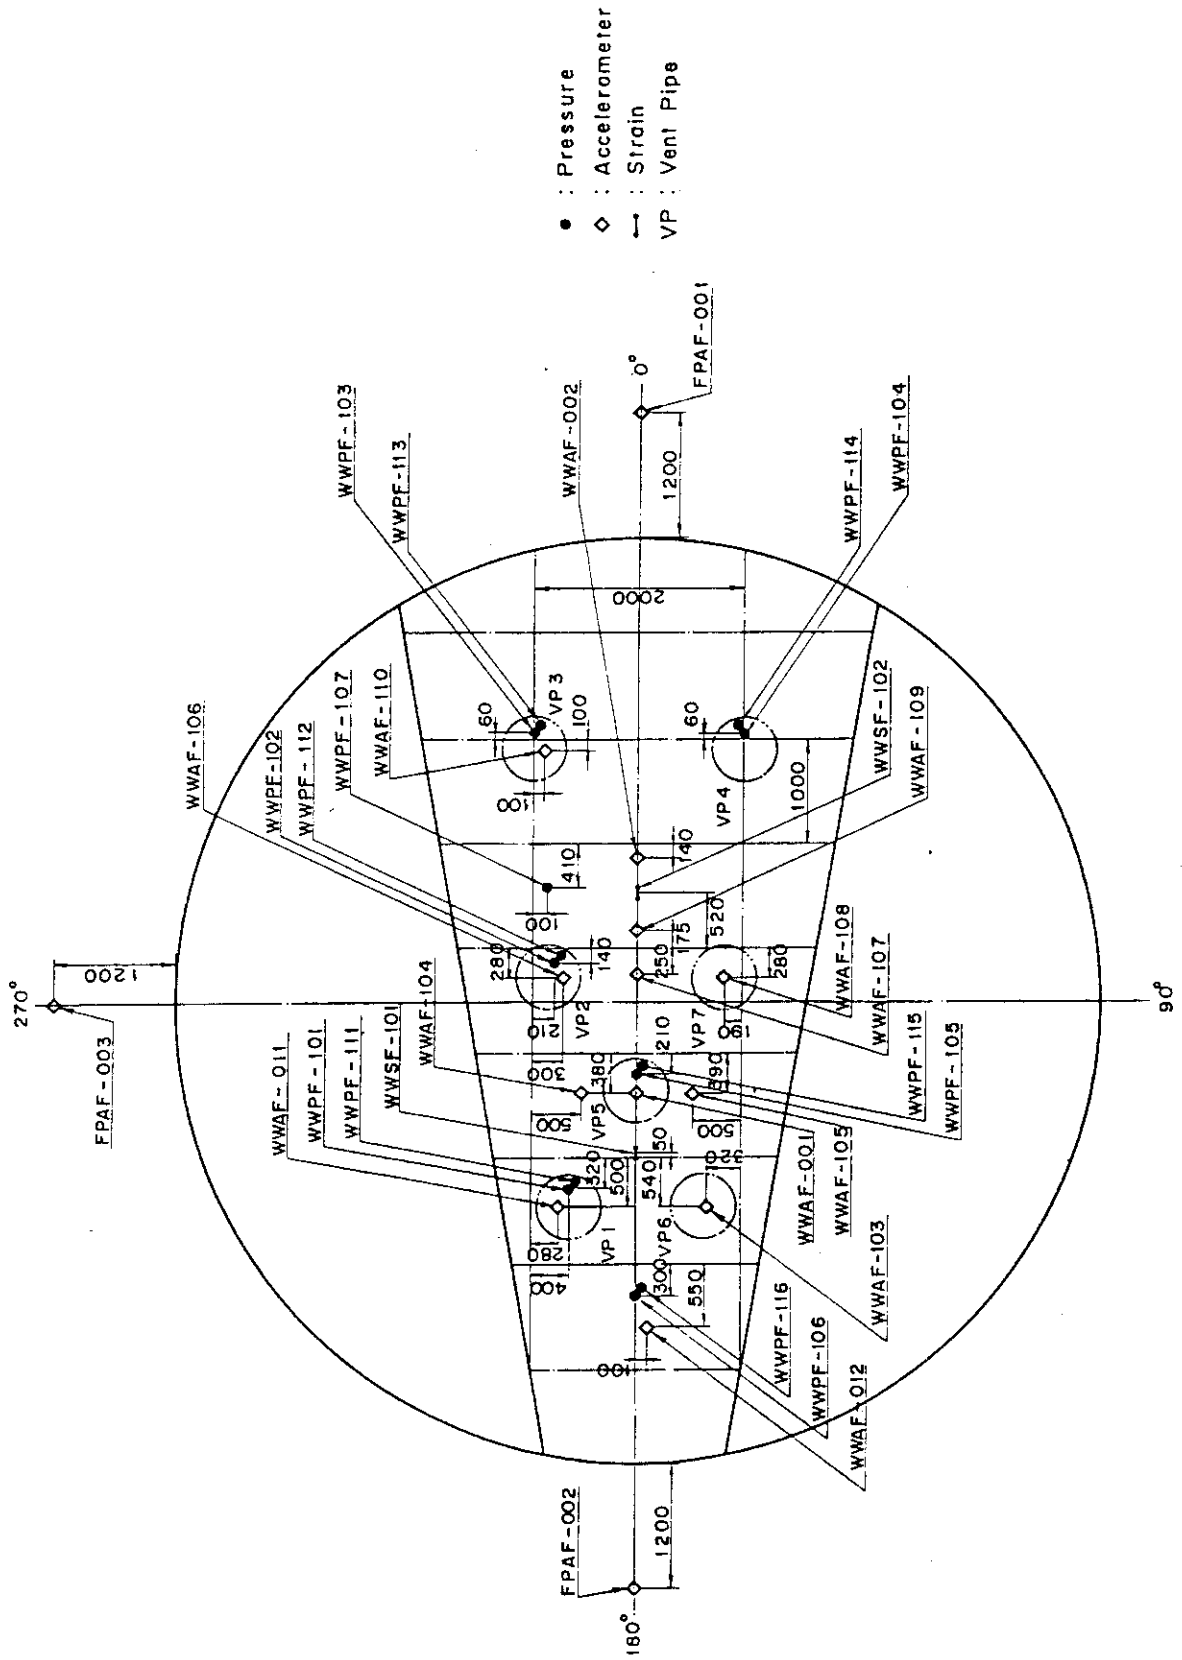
Locations of transducers on wetwell bottom floor (as of after addition)
